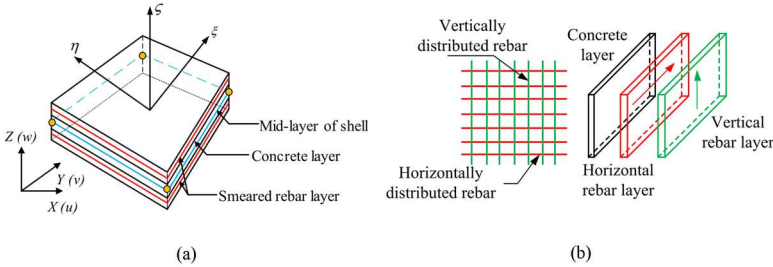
Sketch of multi-layer shell element for RC wall (Lu et al. [37])
